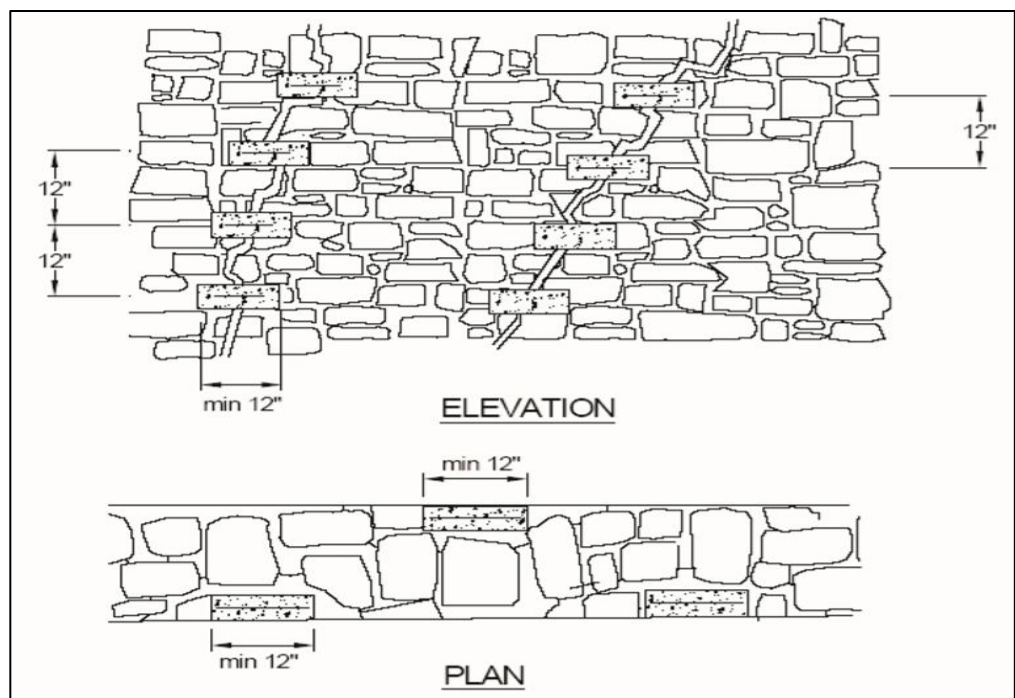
Repair of inclined cracks in masonry walls
